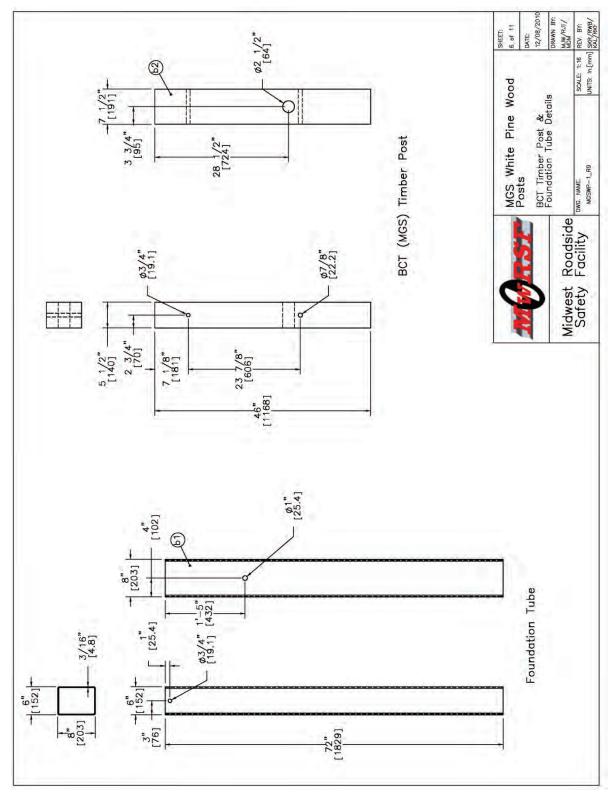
BCT Timber Post and Foundation Tube Details, Test No. MGSWP-1
